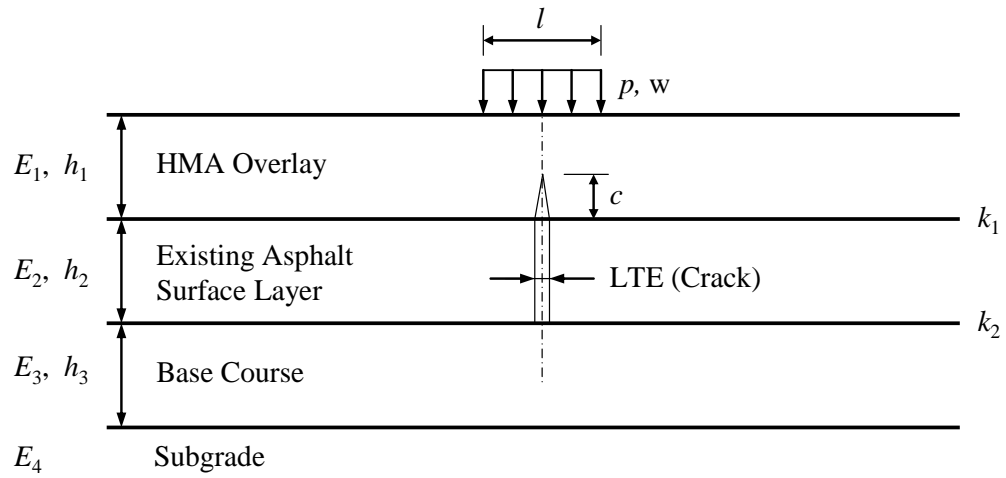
Diagram of HMA overlay on asphalt concrete pavement-bending.
